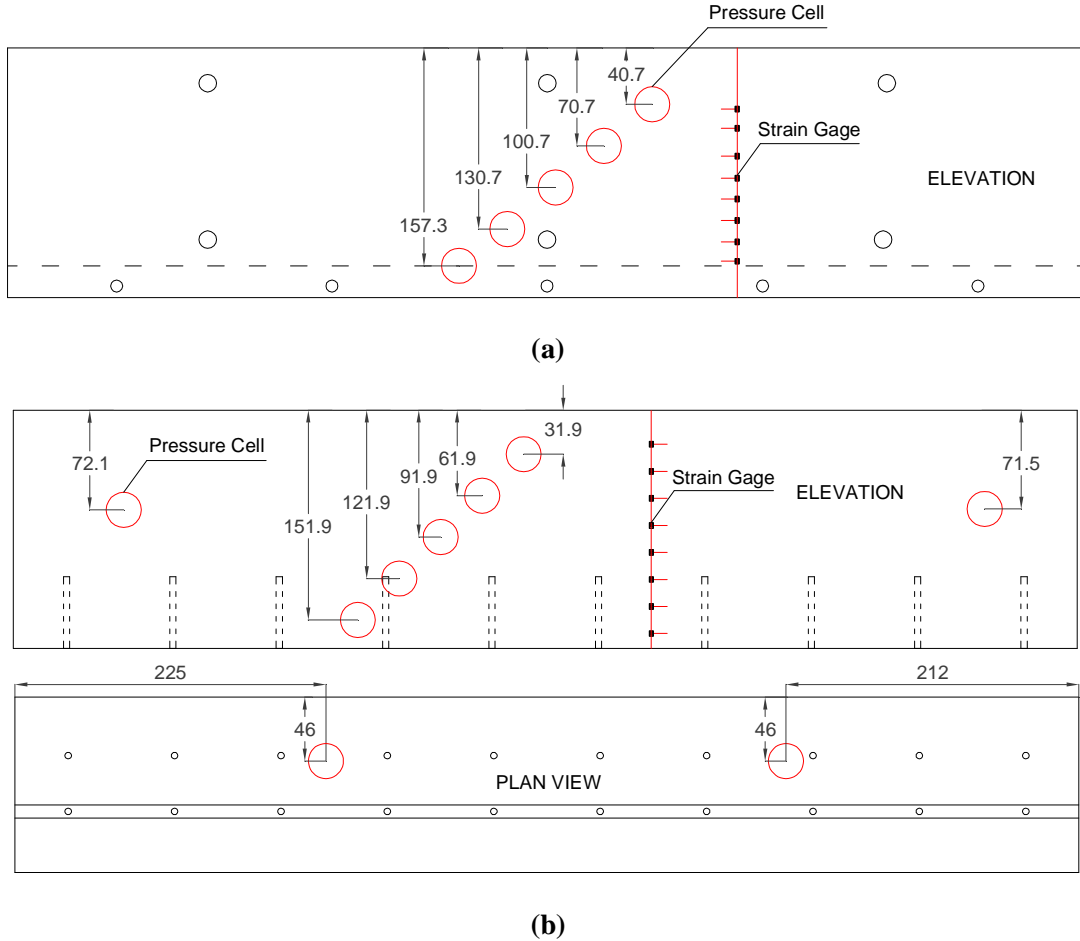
Pressure cells and strain gages layout on (a) Non-Displacing basement and cantilever walls (b) Displacing retaining wall for ROOZ01 and ROOZ02, (dimensions: mm, model scale)
